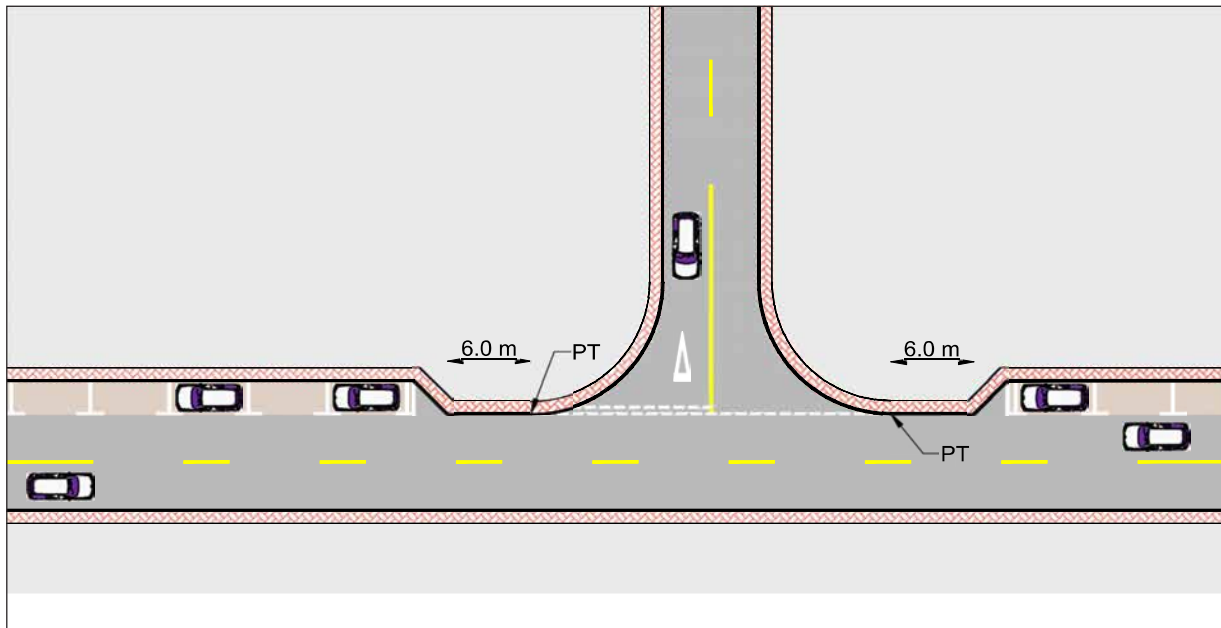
Parking Along Local Access Roads and Minor Collectors
